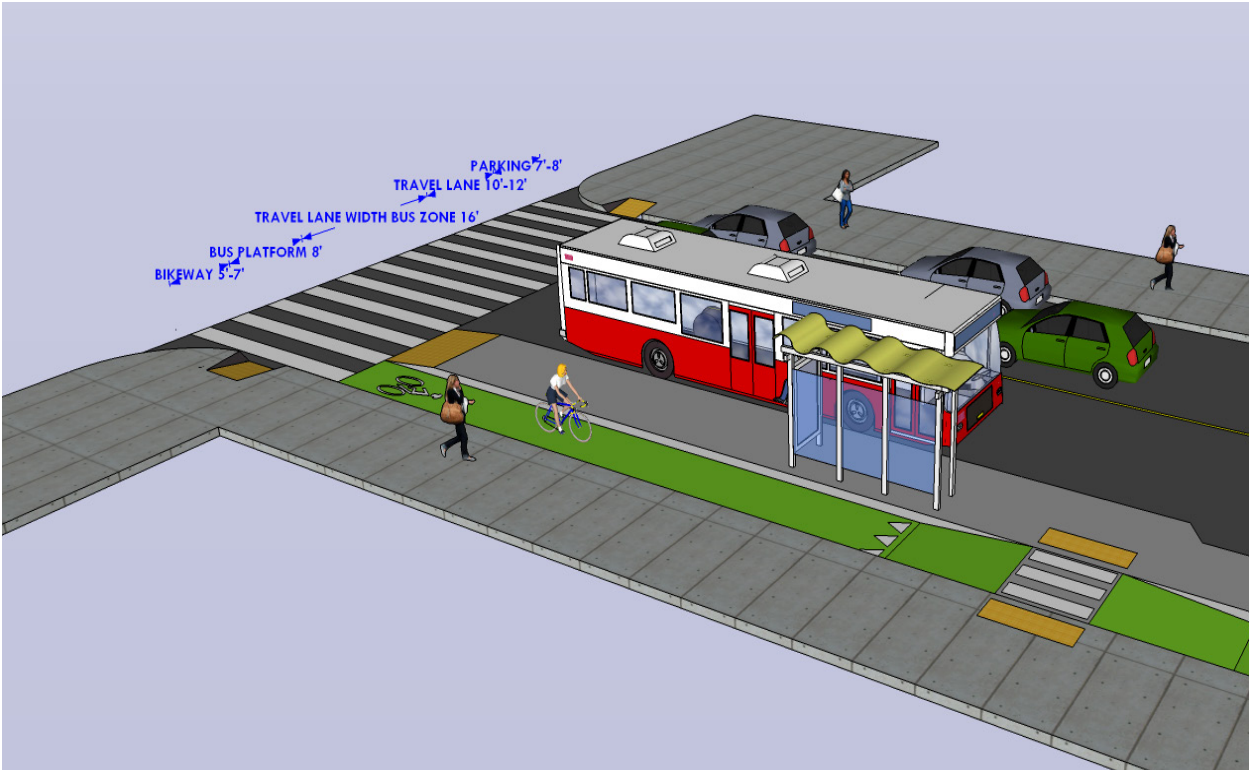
shows a raised transit platform with a curb ramp that leads to a crosswalk.
